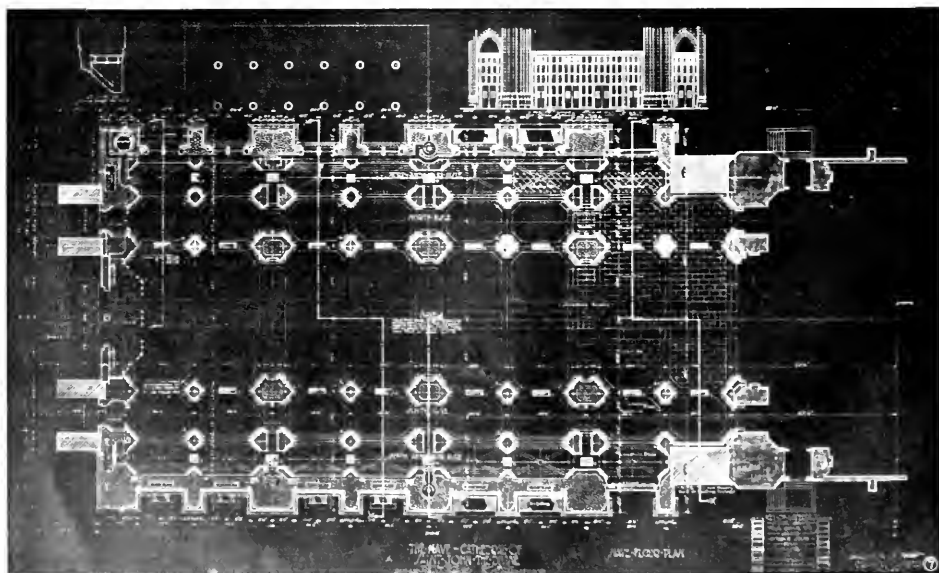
PLAN OF THE NAVE FOR ST. JOHN THE DIVINE NOW BEING CARRIED OUT BY
